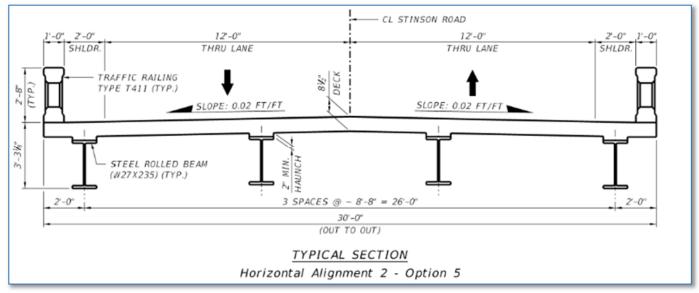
Steel Rolled Beams (W27X235) Typical Section
